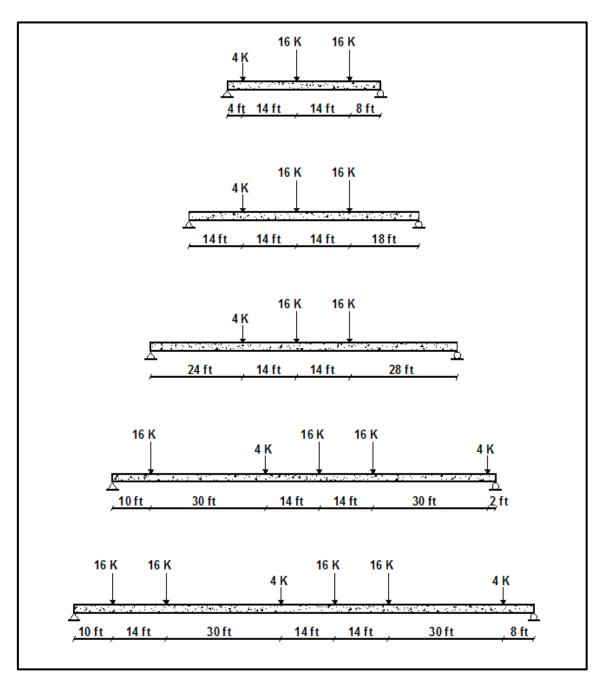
Longitudinal Beam Section of a Single-Span Bridge and Critical Position of HS20 Trucks for the Five Different Span Lengths
